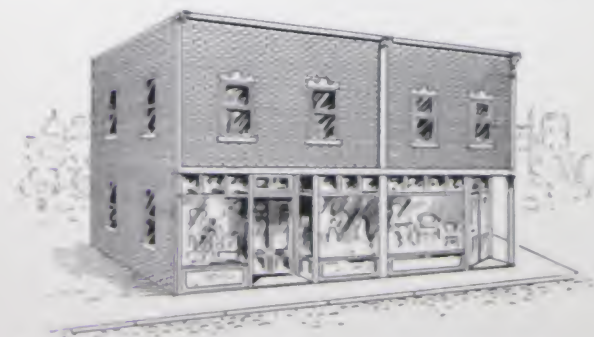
Small Store Building covered with Pressed Brick Siding.
